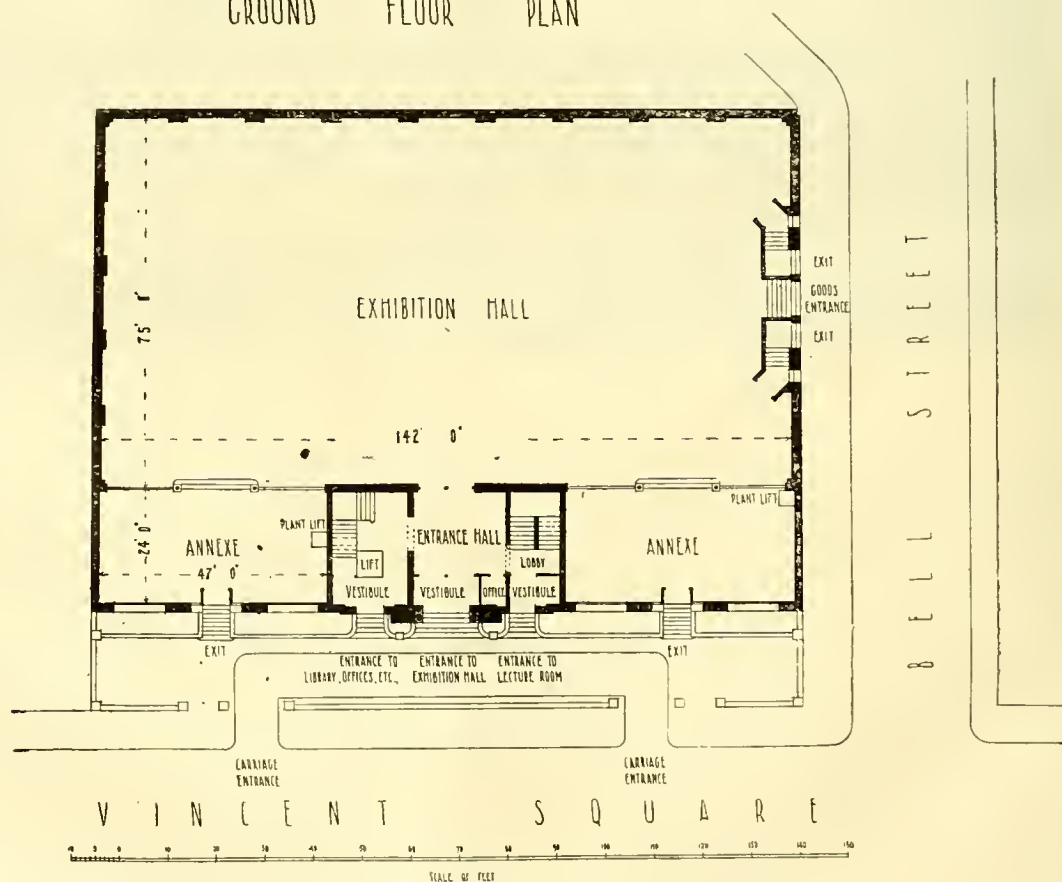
GROUND FLOOR PLAN OF NEW HORTICULTURAL HALL. (SEE P. 378.)
